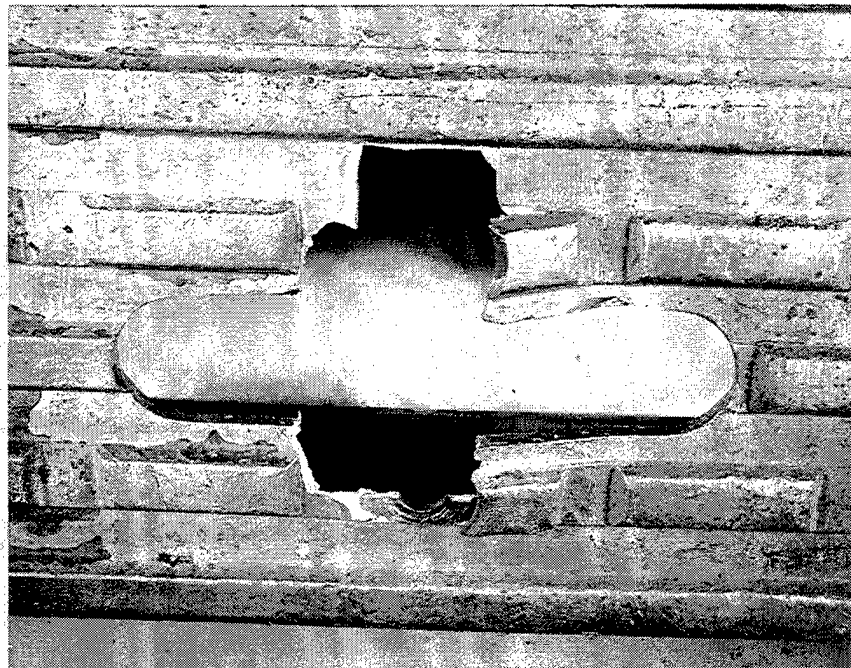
Close-up view of the damaged oblong hole in Figure 57.
